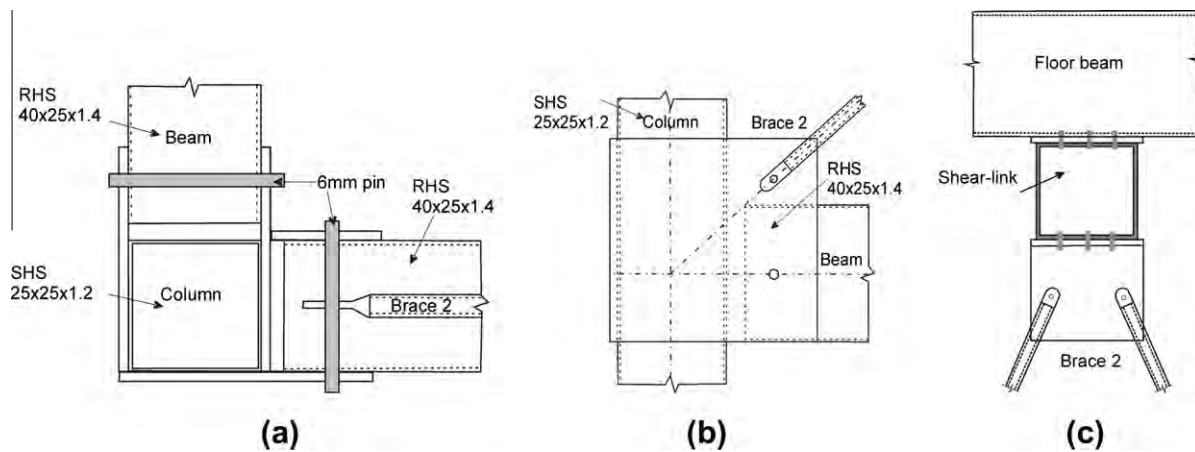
Details of (a) plan of connection A, (b) elevation of connection B, and (c) elevation of connection D.
